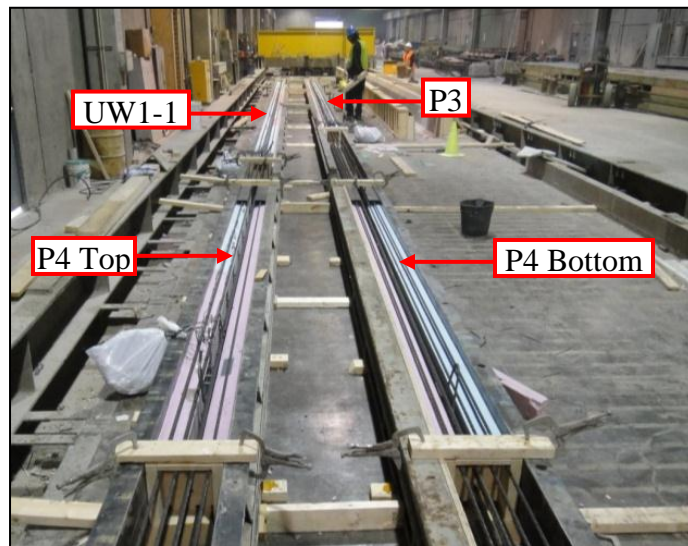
Layout of U&HPC Piles P3, P4 and UW1-1
